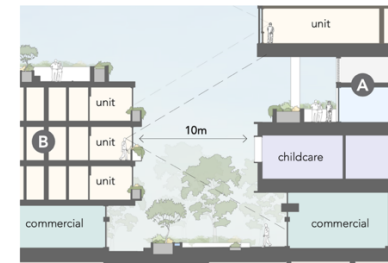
Section Detail indicating building separation between the childcare and residential units in BLD B.
